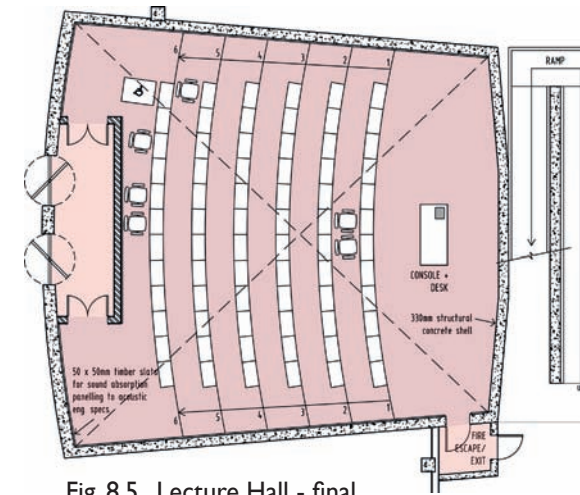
Lecture Hall - final plan design (Author, 2011).
